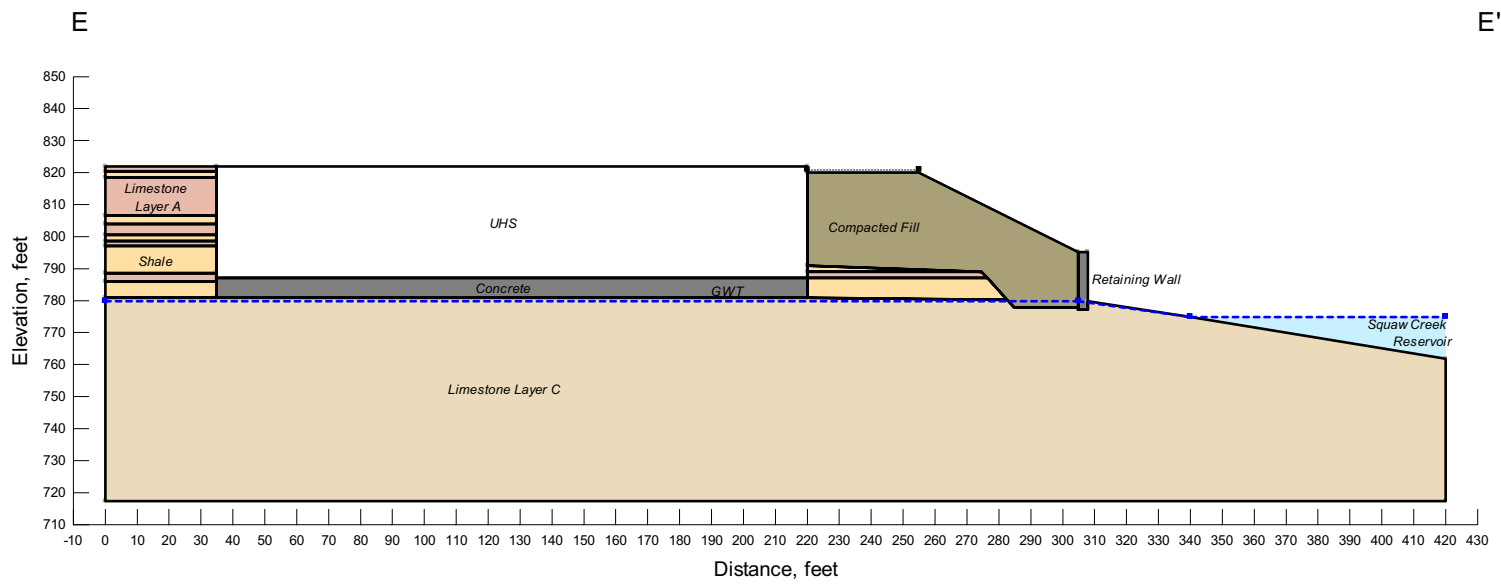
Post-Construction Cross Section E-E'
